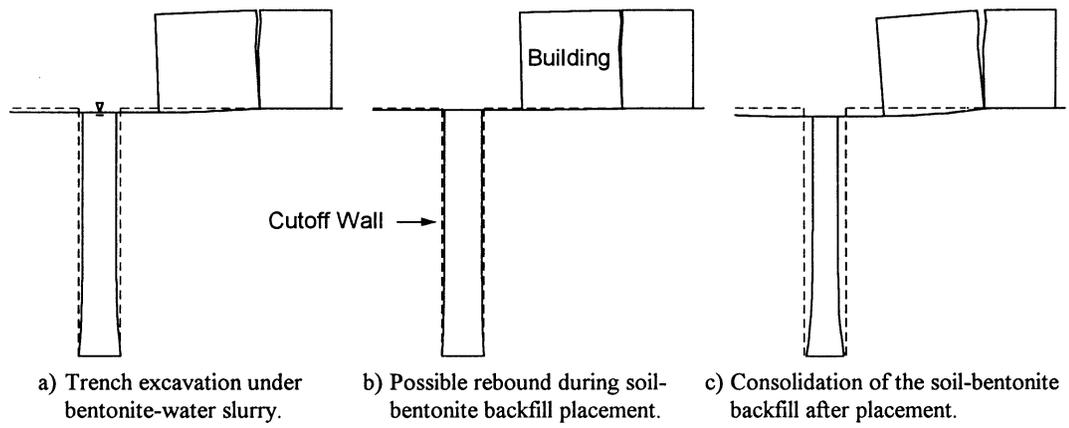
Ground Deformations Due to Construction of a Soil-Bentonite Cutoff Wall (Filz 1996)
